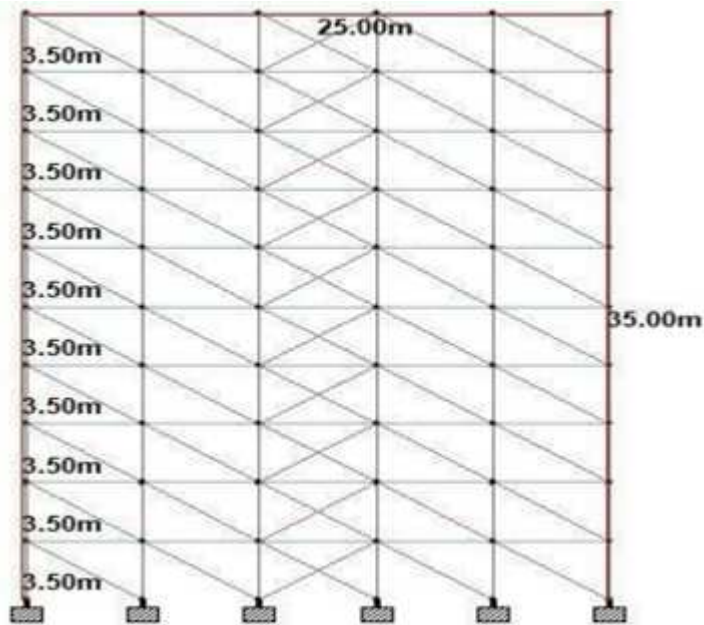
Elevation of flat slab building having 80 % infill walls
